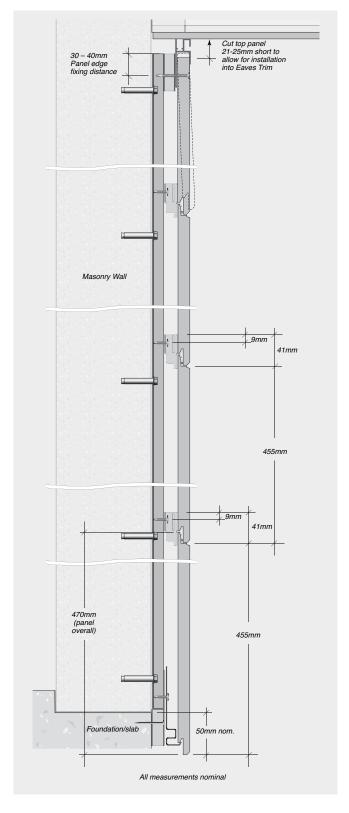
Typical Territory System Cross Sectional Detail for Masonry substrate where face fixing is required – Elevation
